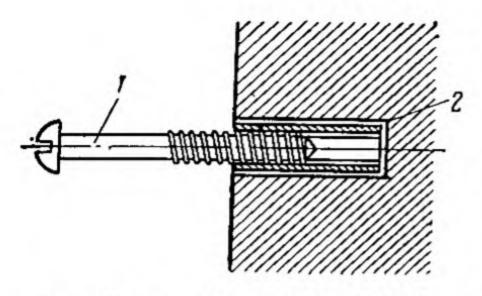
Screw driven into rolled piece of p.v.c. tubing to fix a knob insulator:
